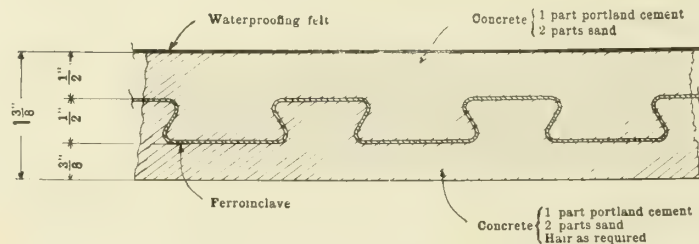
Section of Ferroinclave Roof as used on Span of 4' 10 1/2" C. to C. of Purlins. For longer Spans increase the thickness of concrete above the Ferroinclave from 1/2" to the following: Span 6'; concrete on top 3/4". Span 7'; concrete on top 1 1/4". Span 8'; concrete on top 1 3/4". Weight per square foot as shown, 16 lbs.
